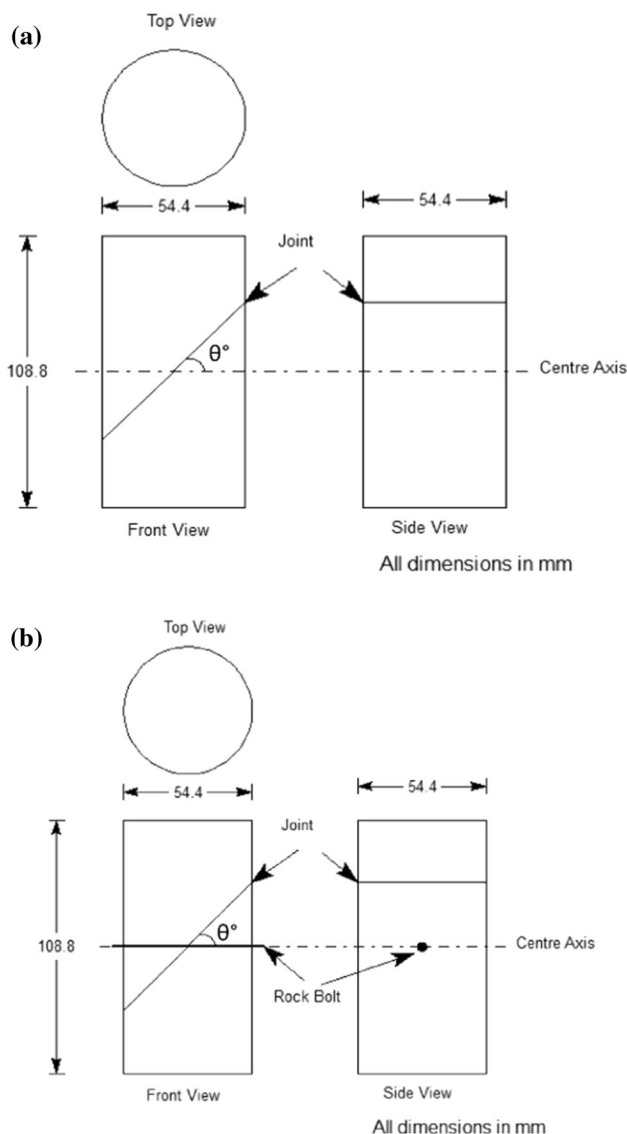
a Line diagram of unreinforced jointed rock specimen. b Line diagram of reinforced jointed rock specimen
